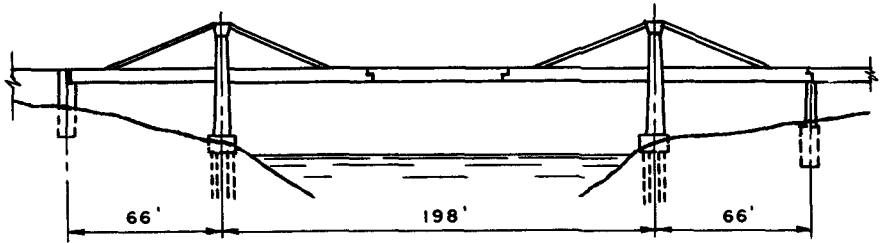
Fig. A. Torroja's prestressed suspended concrete bridge, Tempul Aqueduct.
